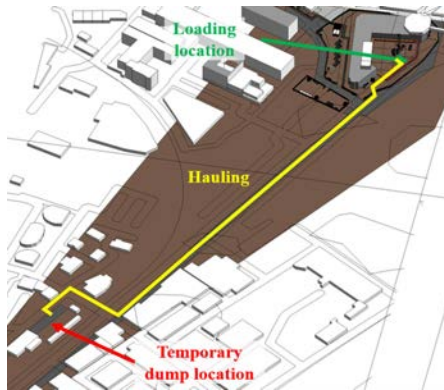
BIM-based construction site layout visible in the online user interface on the Digital Twin Platform
